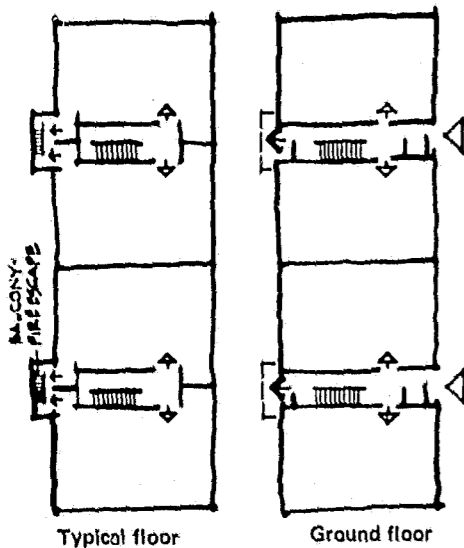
Four- to five-story walk-up, using scissor stair. (a) typical floor; (b) ground floor.
